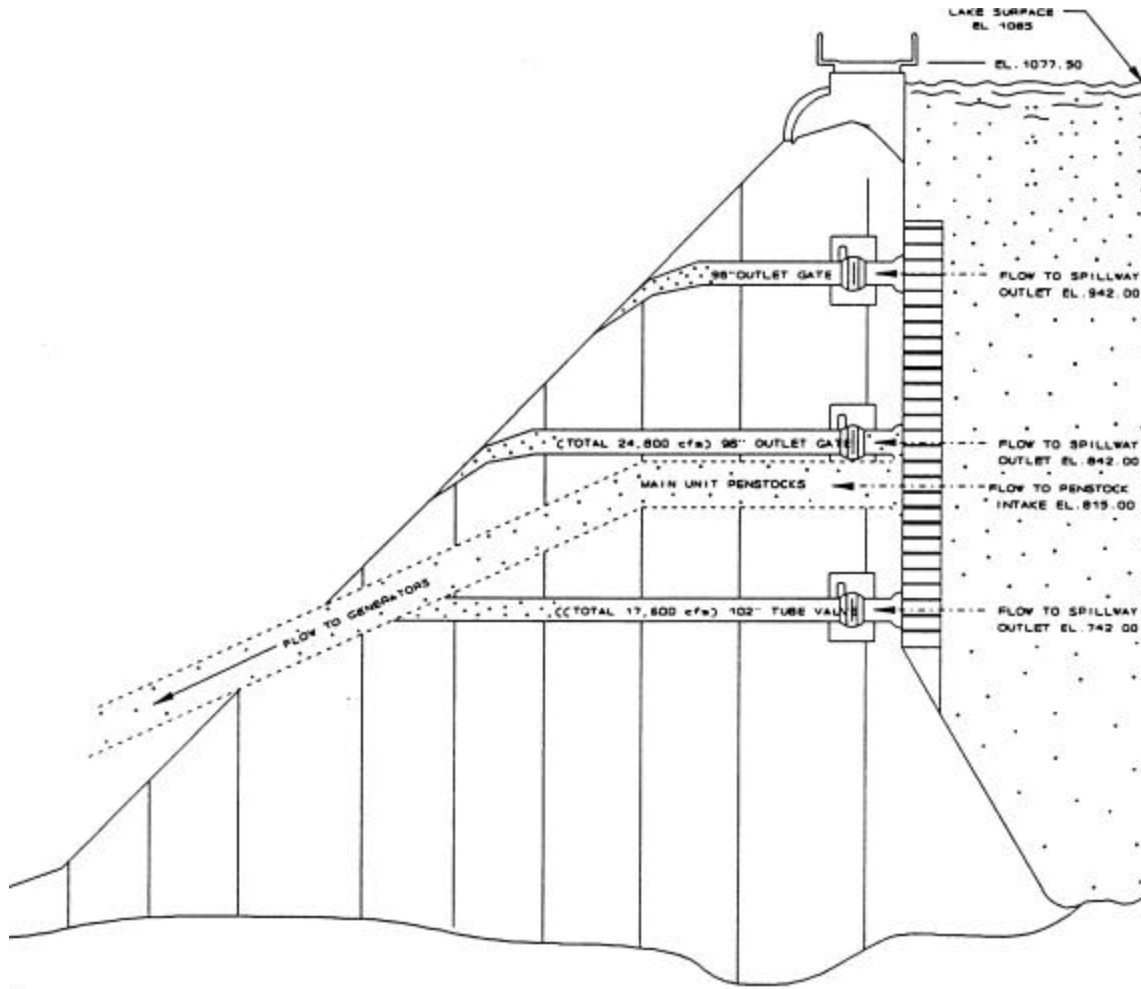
Existing Shasta Dam spillway outlets and penstocks.
